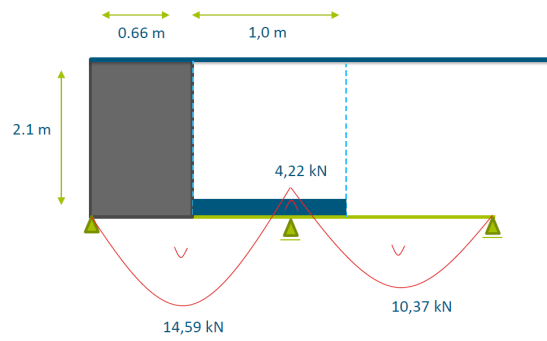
Moments in floor after placing the new floor and the sand bags.
